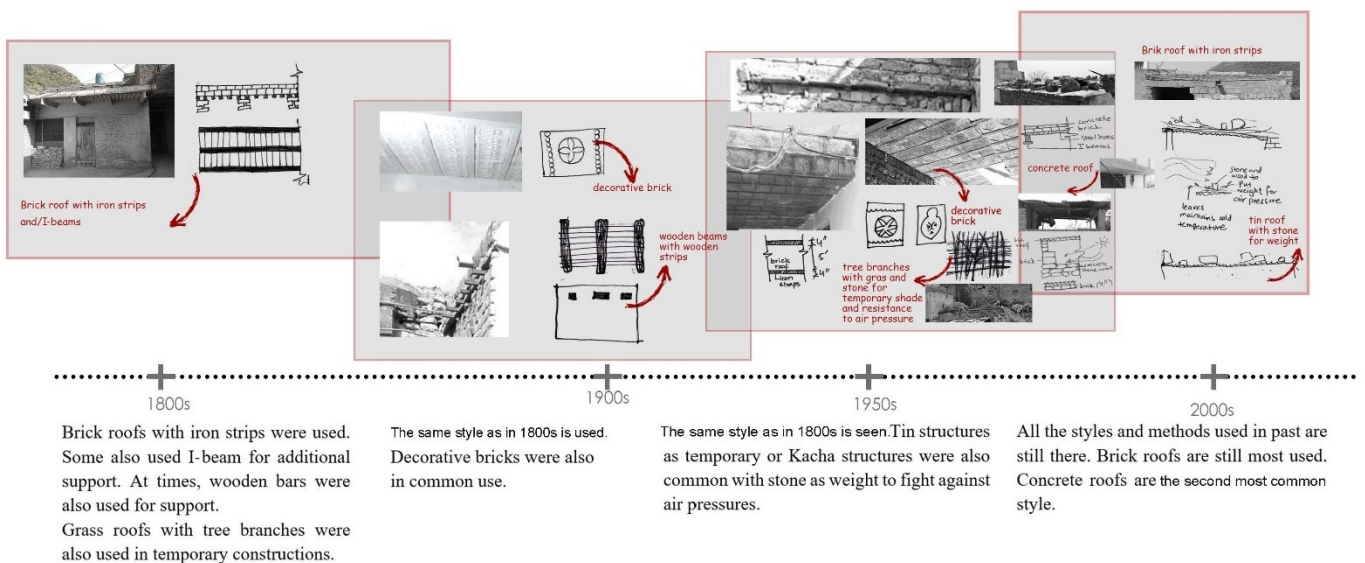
Roof constructions. (Source: Ramsha Nazir Malik)
